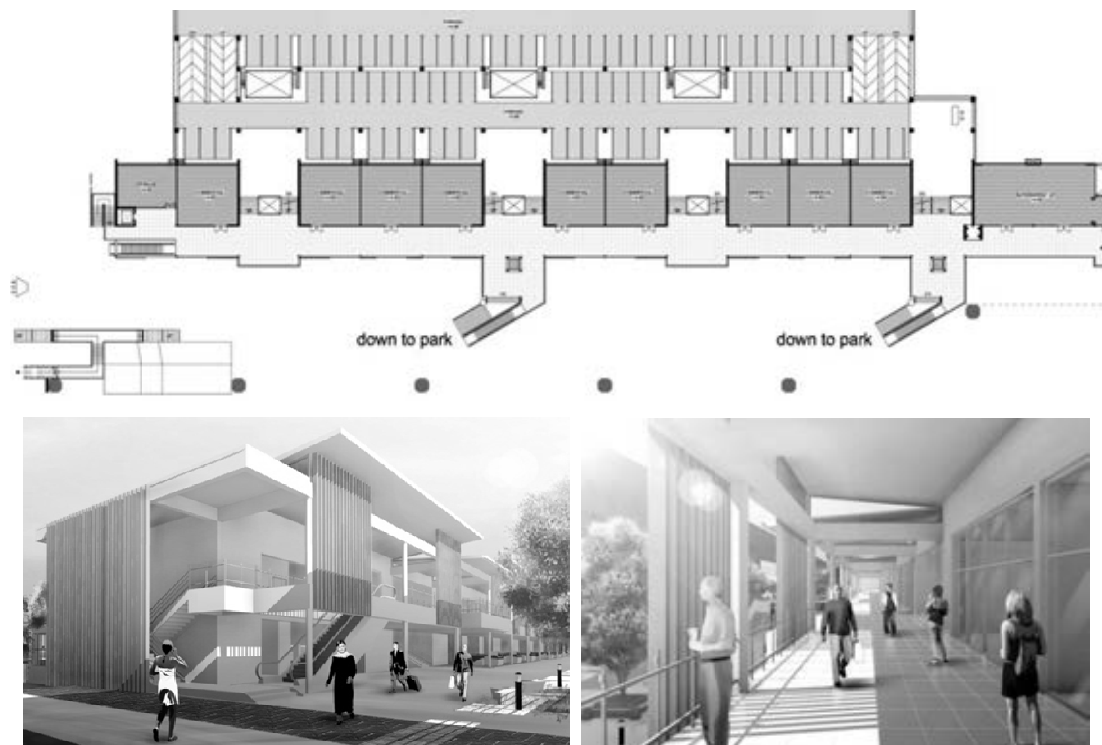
Small retails/ shops on second floor, connecting parking building and pedestrian corridor
